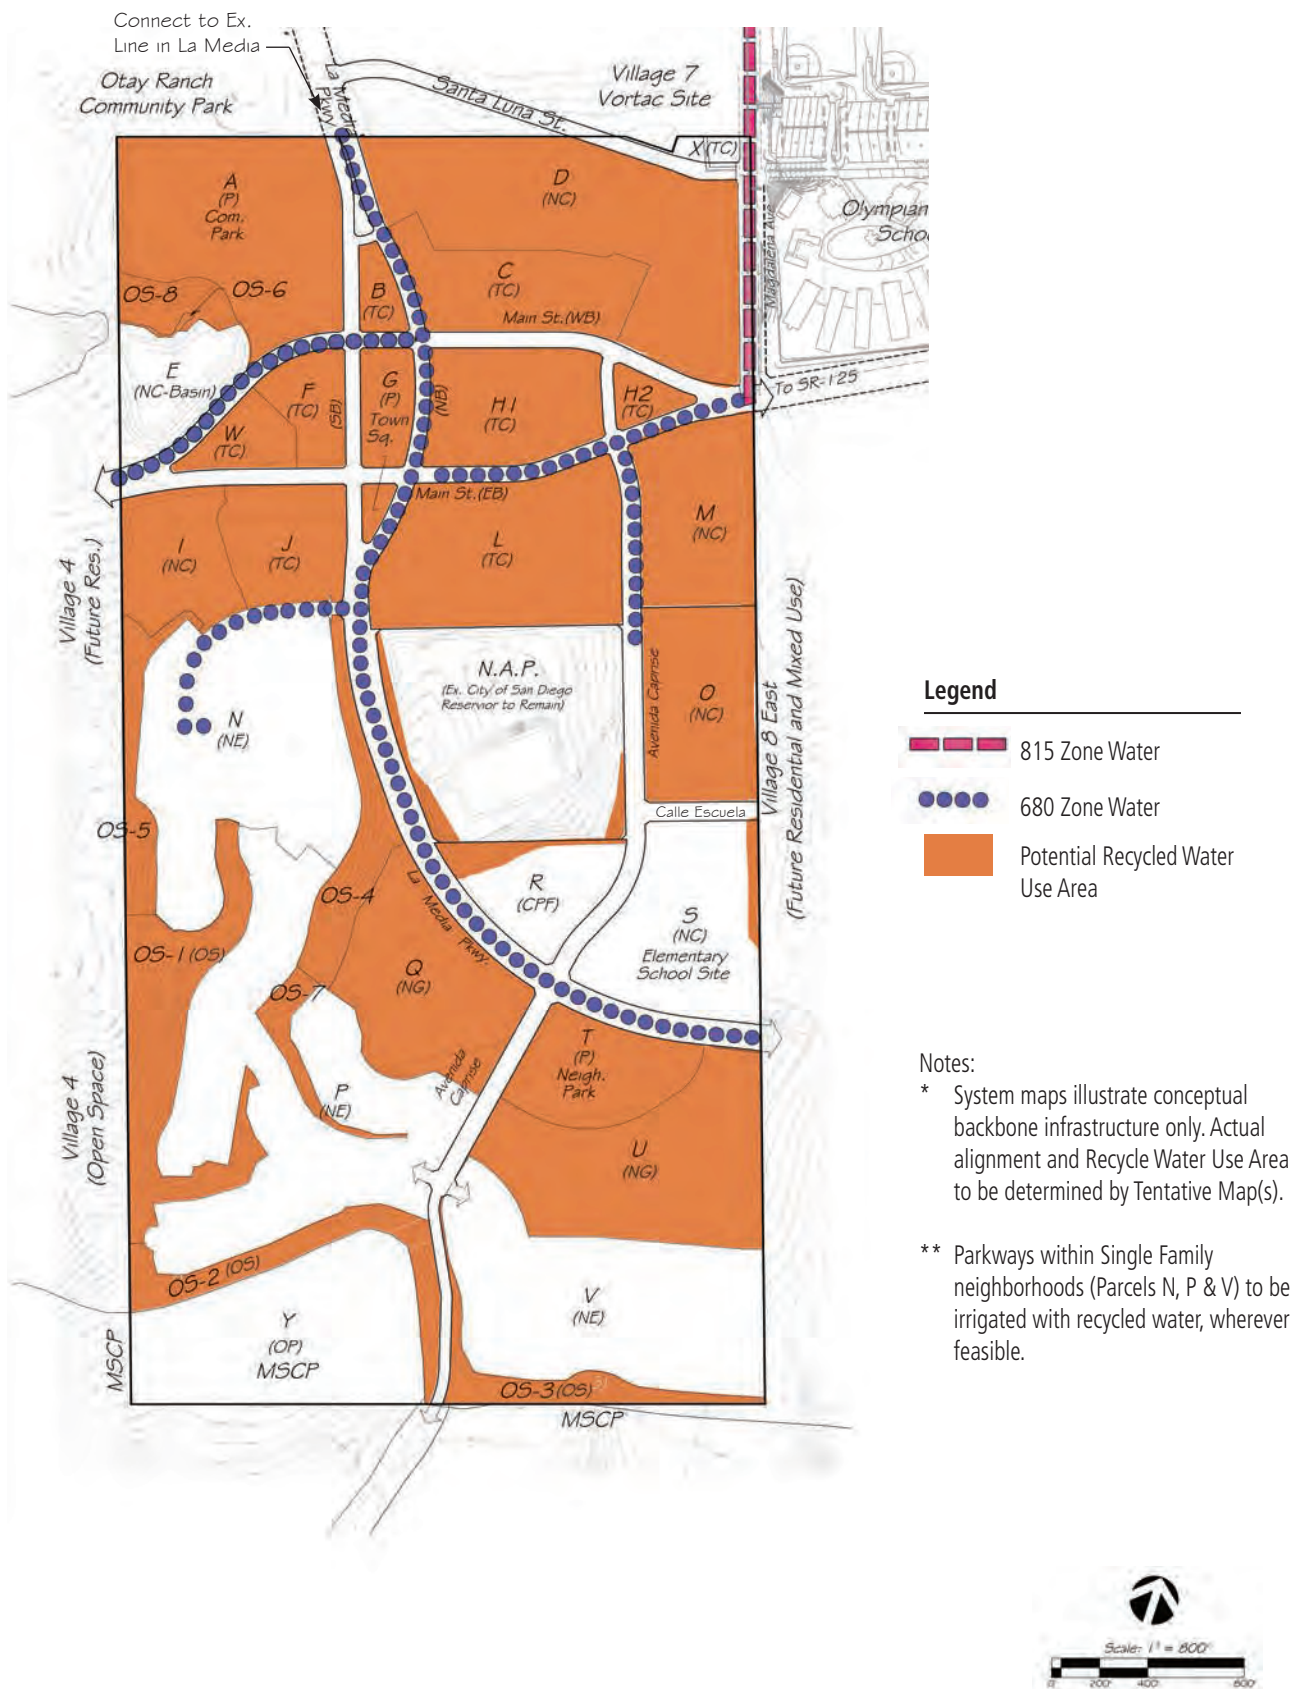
Conceptual Recycled Water Master Plan
